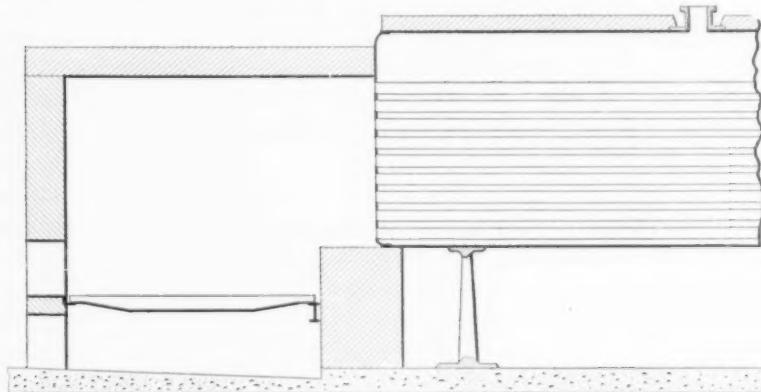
SETTING OF A FIRE-TUBE BOILER IN WHICH THE TUBES LEAK
